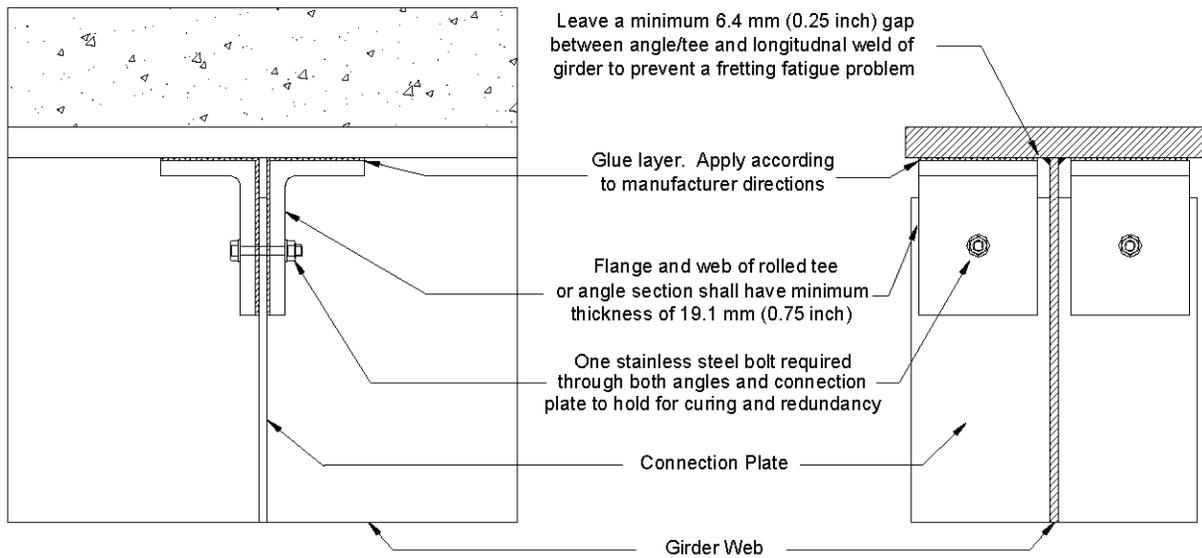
Work plan for stiffening retrofit of web-gaps with adhesives. (Hu 2005)
